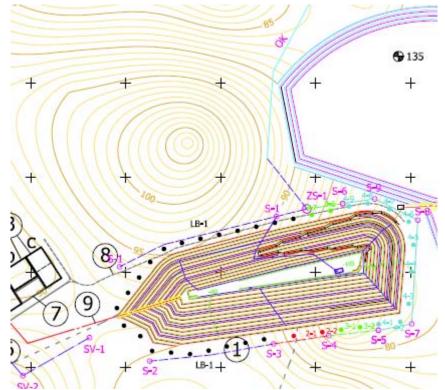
Plan of Dewatering at the end of Stage 3 of the Mine Opening
